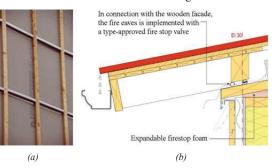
Fire barriers in the ventilation gap and eaves of the wooden facade: (a) fire stops of the wooden facades; (b) The air space of wooden facades must be separated from the attic space by A2 class fire board (30 min. sheeting) and facade and attic should be ventilated separately (Images by authors).
